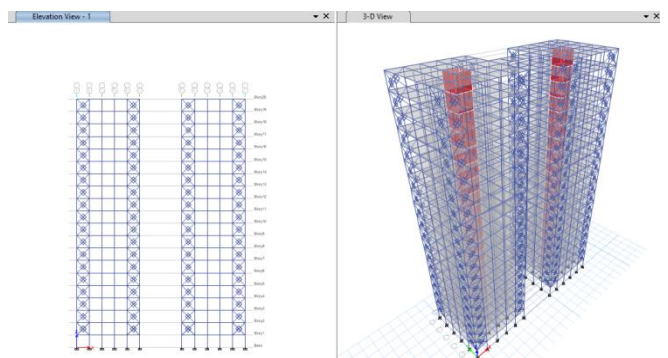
Elevation and 3d View (Model 2 with Dampers)
